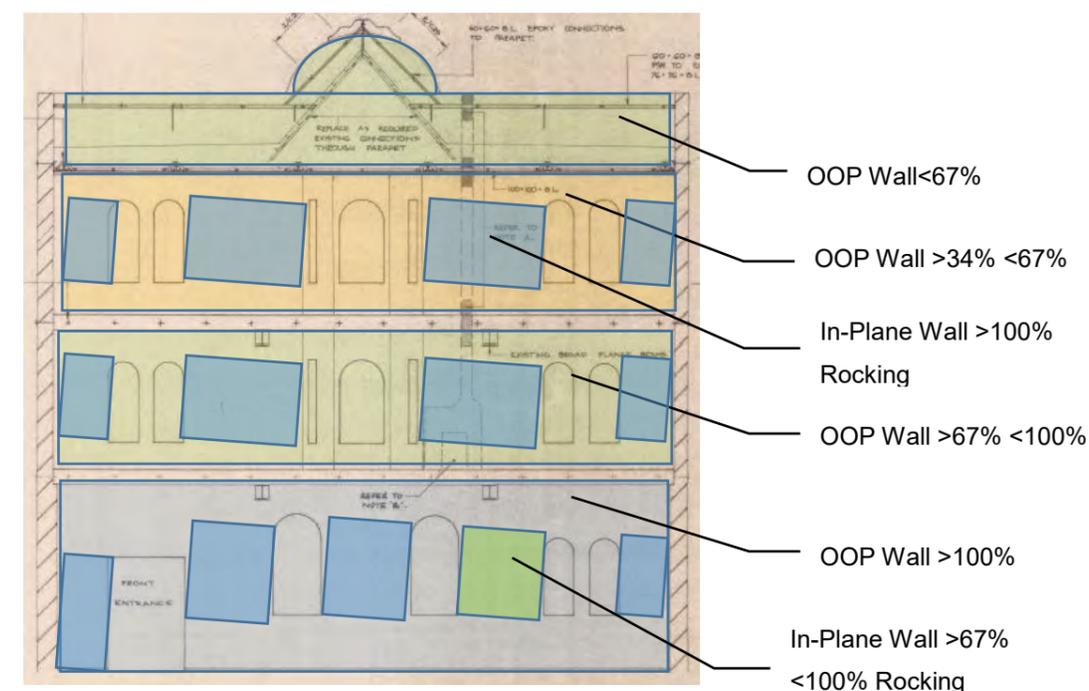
Sketch of Front elevation URM element Outputs and Out of Plane Capacities
